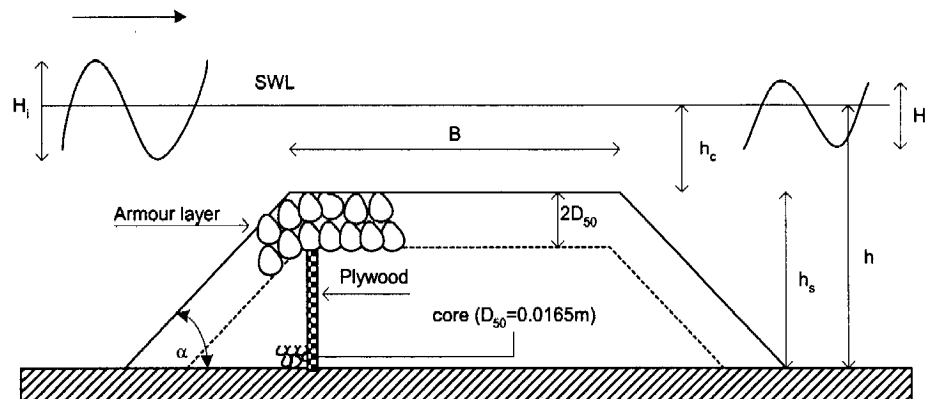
Cross-section of permeable breakwater model at water depth above the crest (not to scale).
